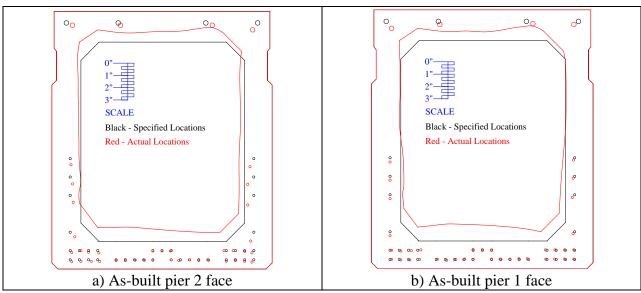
As-Built Section Geometry of Span 2 Beam 4 of Clearfield Creek Bridge
